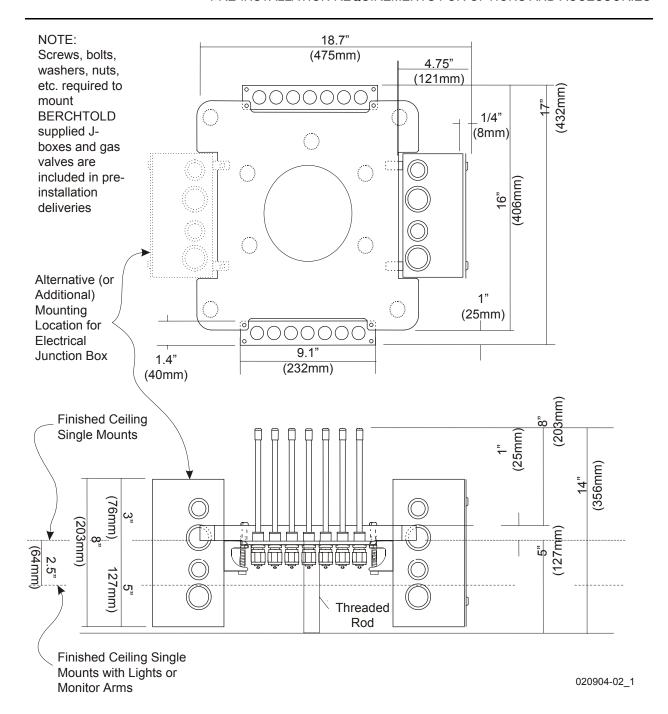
TELETOM® Equipment Management System Mounting Plate and Accessory Dimensional Information
